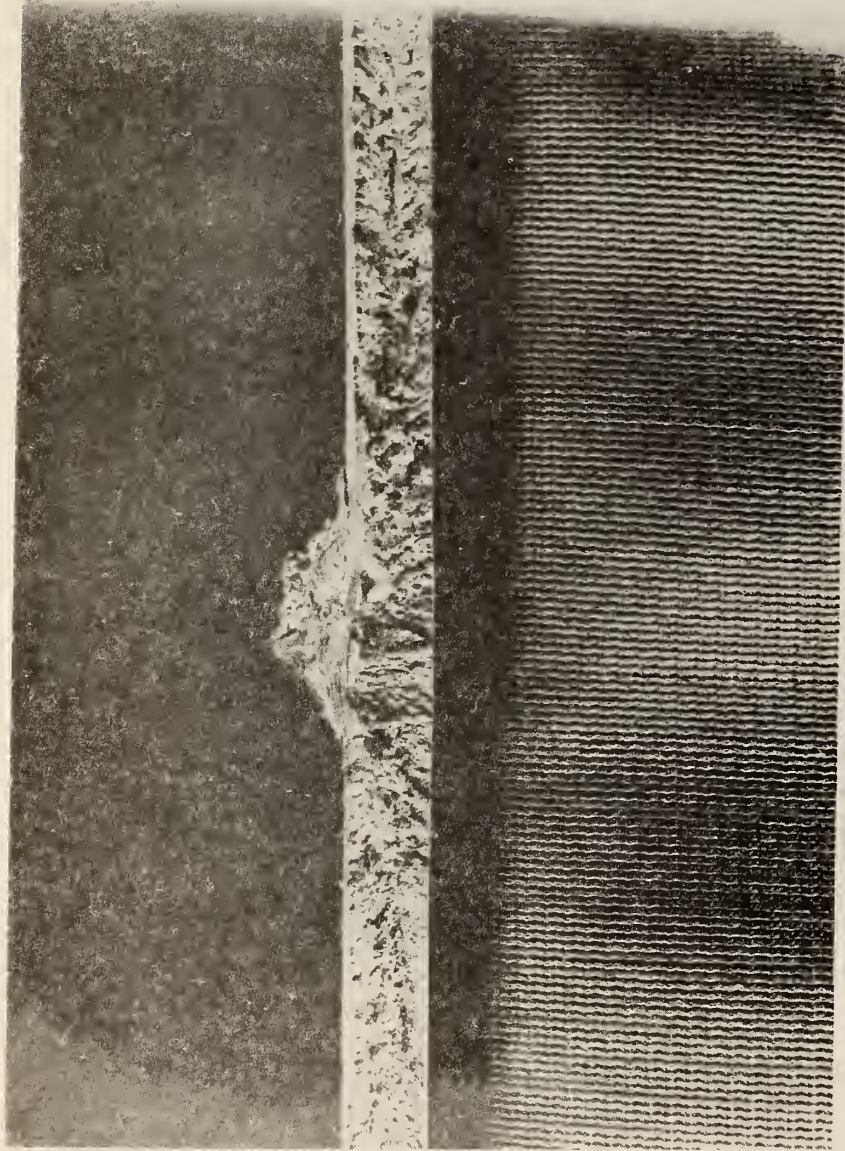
Fracture surface of web near longitudinal stiffener.
